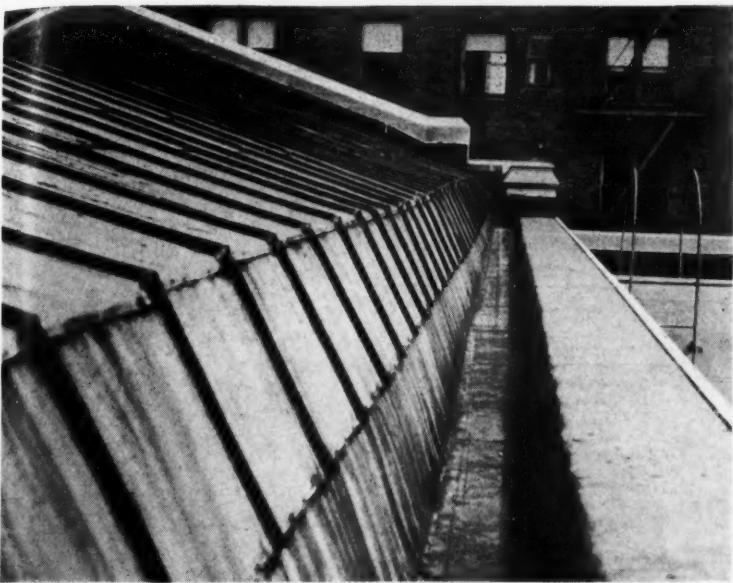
Bringing a standing seam over a break in slope and patching it up with solder makes a poor-looking and unsatisfactory job. The gutter lining should not have been locked directly into the reglet, but into a separate reglet strip.
